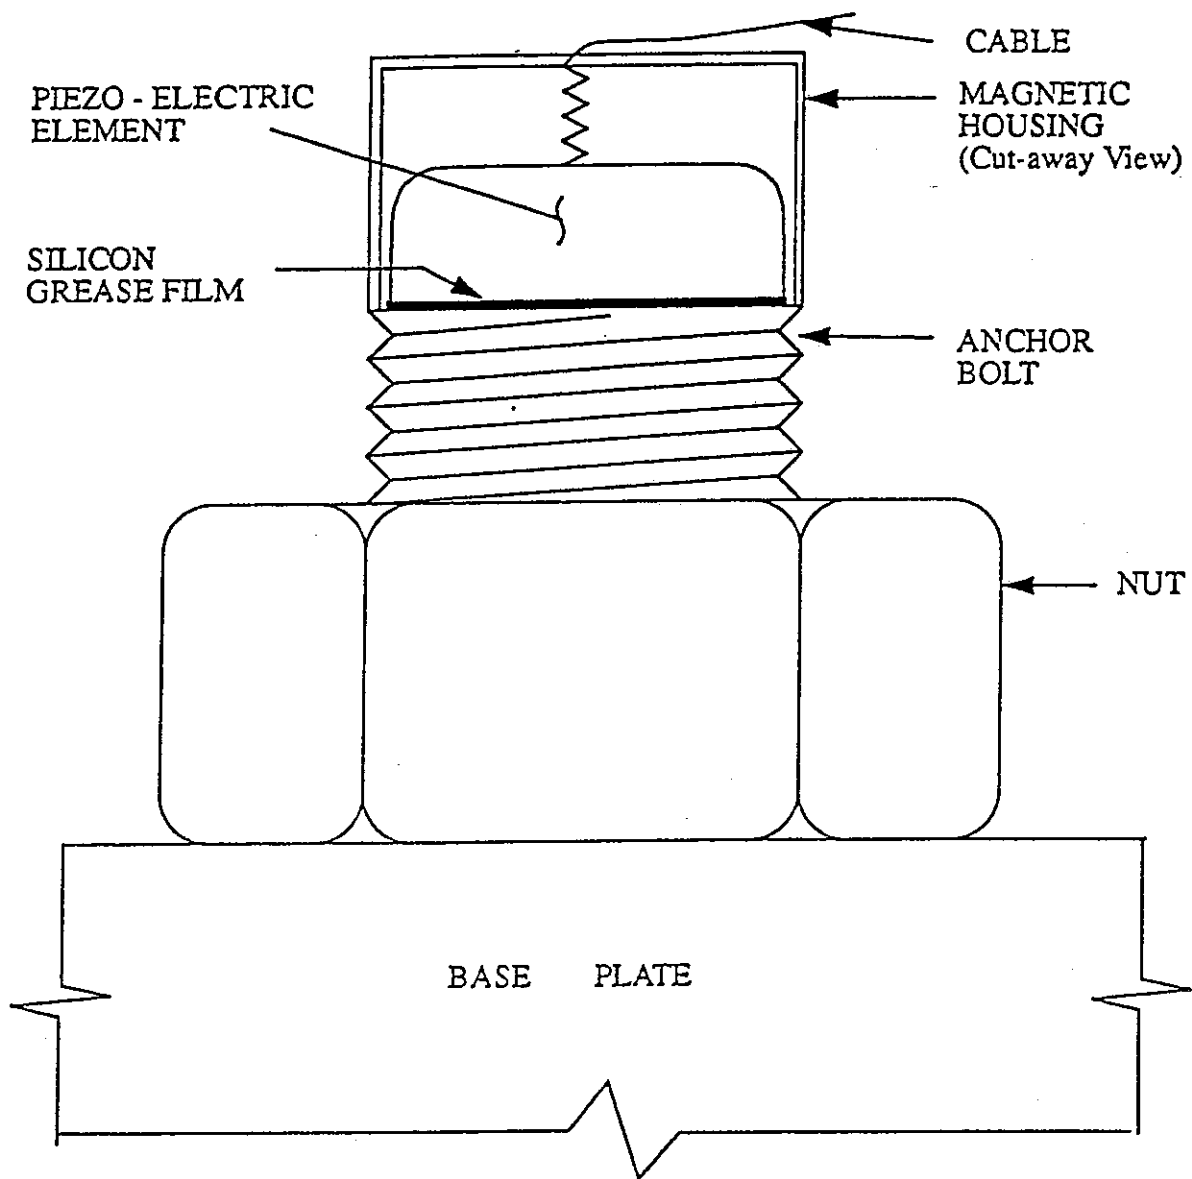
Transducer Mounting on Anchor Bolt
